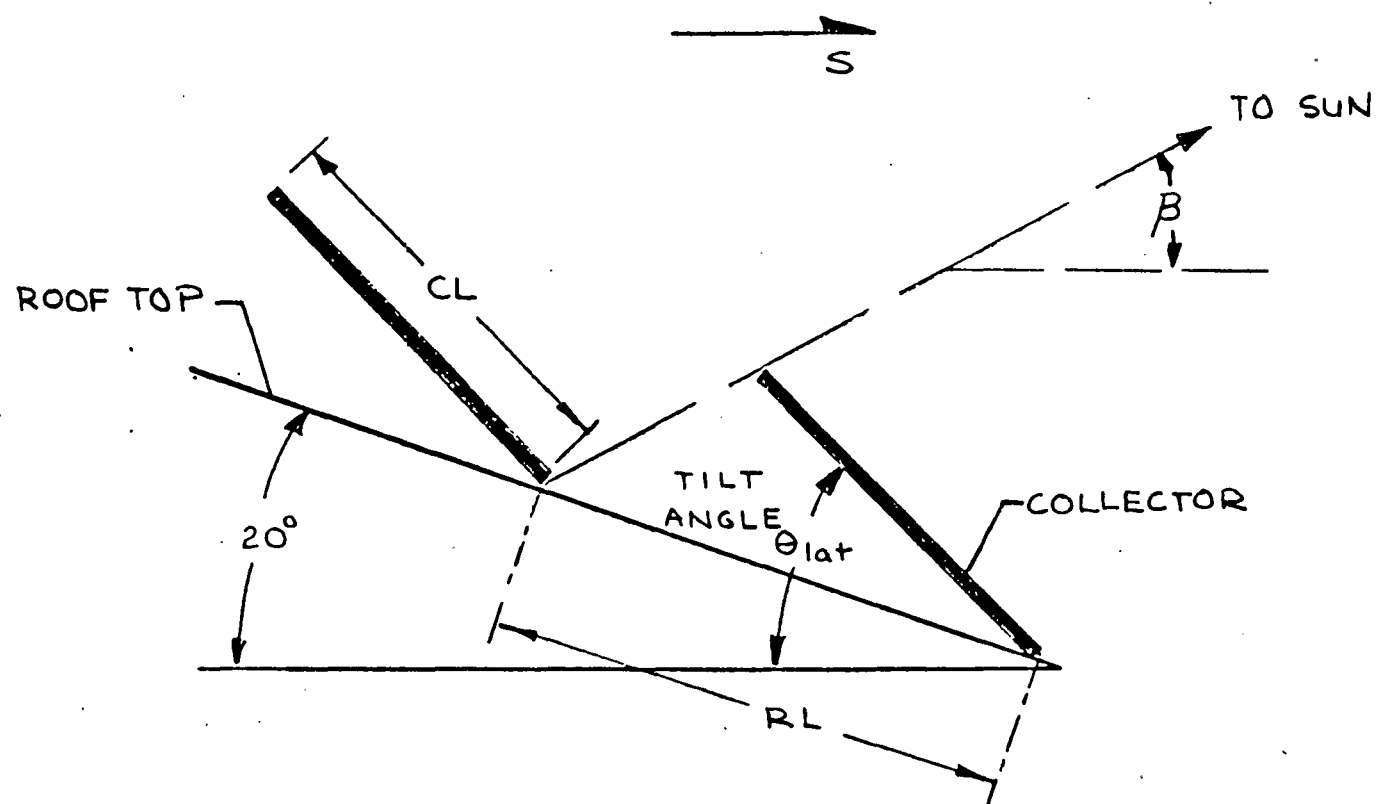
REQUIRED SPACING ON A SLOPED ROOF
